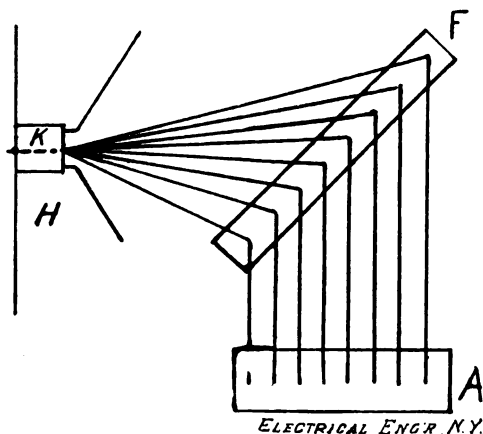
METHOD OF FASTENING HEAVY CONDUCTORS.
